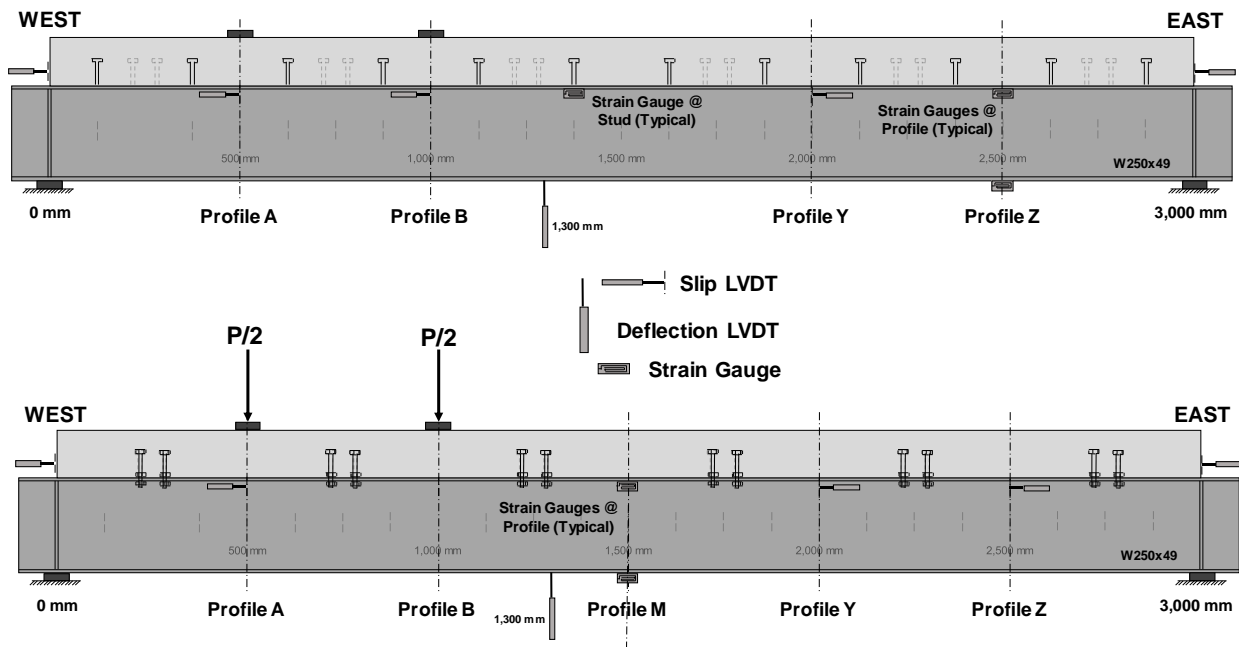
Beam test specimen instrumentation for the stud and bolt specimens.
